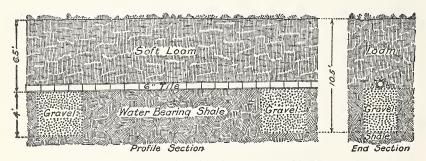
Collecting pits in connection with tile drains as used in Montrose County, Colo.
